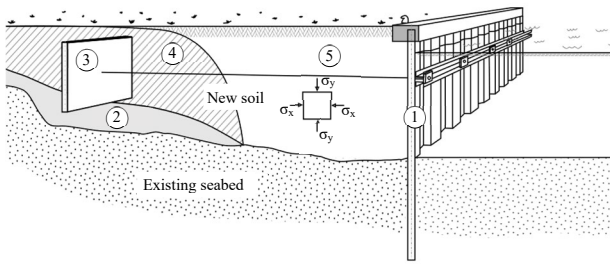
Illustration of the steps when constructing a new quay wall. (1) The sheet pile wall is installed into the seabed. (2) The sea area behind the sheet pile wall is filled with soil in such a way that the sheet pile walls do not experience a large force from it. (3) The anchor plates and anchor tie rods are installed. (4) The soil around the anchor plate are installed. (5) The soil next to the sheet pile wall can be installed.
